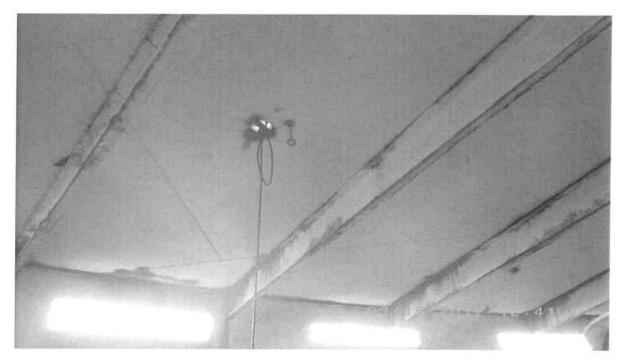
Interior Channel Typical Flange Corrosion
